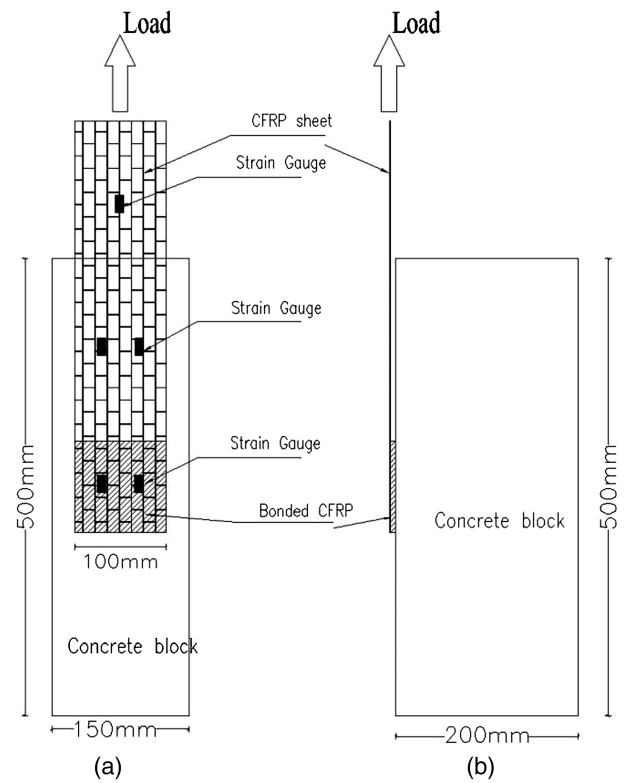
Pull-out test for adhesive: (a) front view; (b) side view
